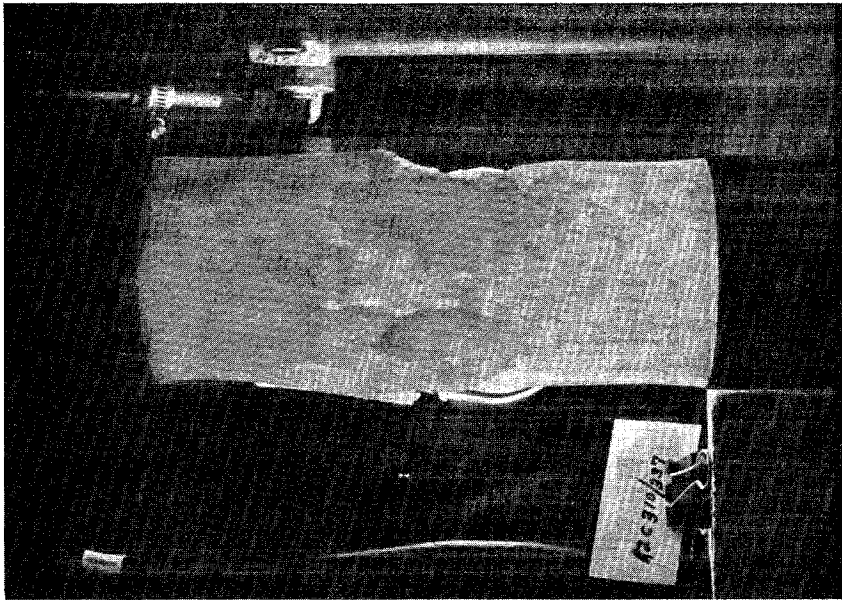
Photographic example of the fundamental longitudinal splitting failure mode.
